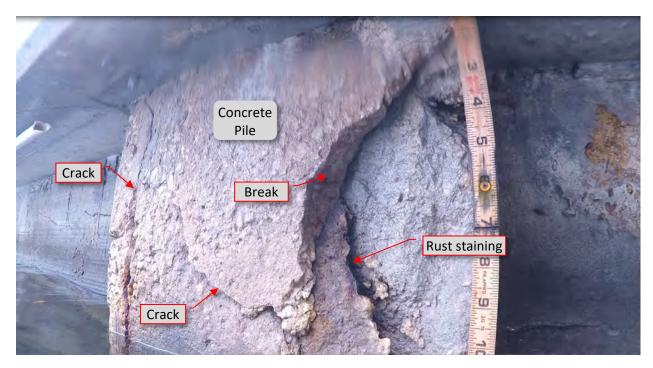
P29. STA 4+92. Cracked and spalled east flange, south face and west flange, rust staining, and loss of concrete at pile.
